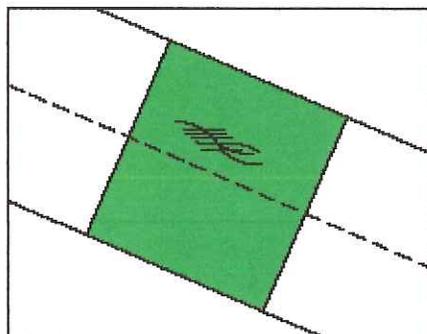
Damaged pavement within 10 feet of a patch must also be patched.
